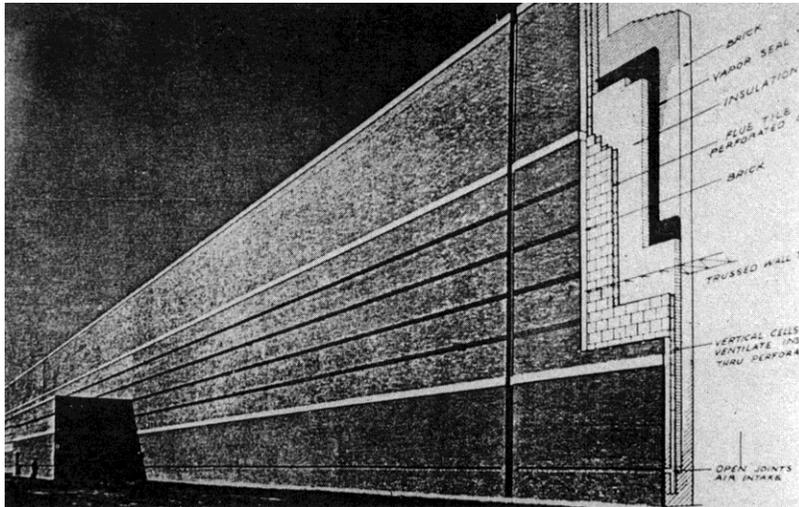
Breathing Wall. Tinker AFB, Oklahoma
